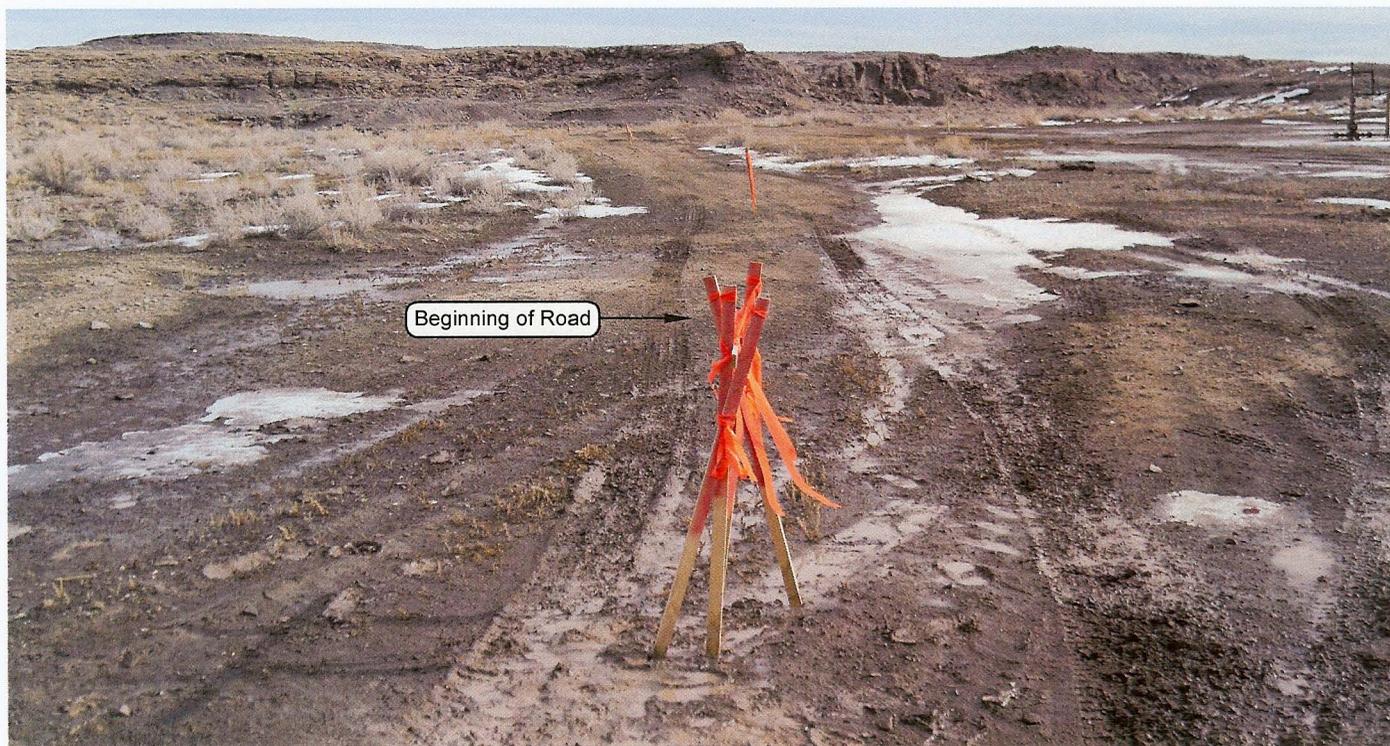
PHOTO VIEW: FROM BEGINNING OF PROPOSED ROAD
